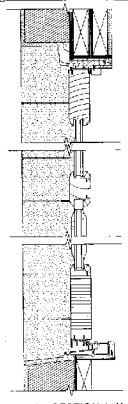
DETAIL OF "KING ARCHITECTURAL METALS" MODEL 45-9827
